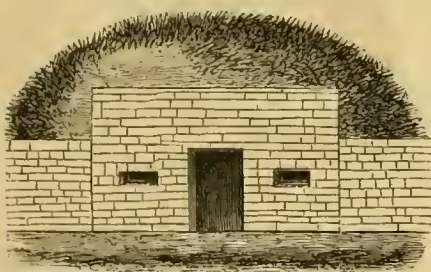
ROOT HOUSE WITH STONE FRONT.
